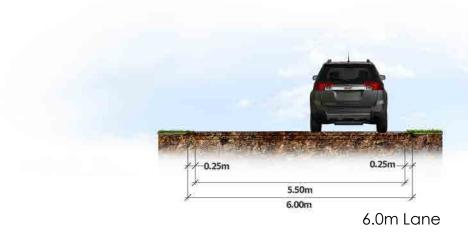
Transportation Details Oxford Landing Outline Plan
